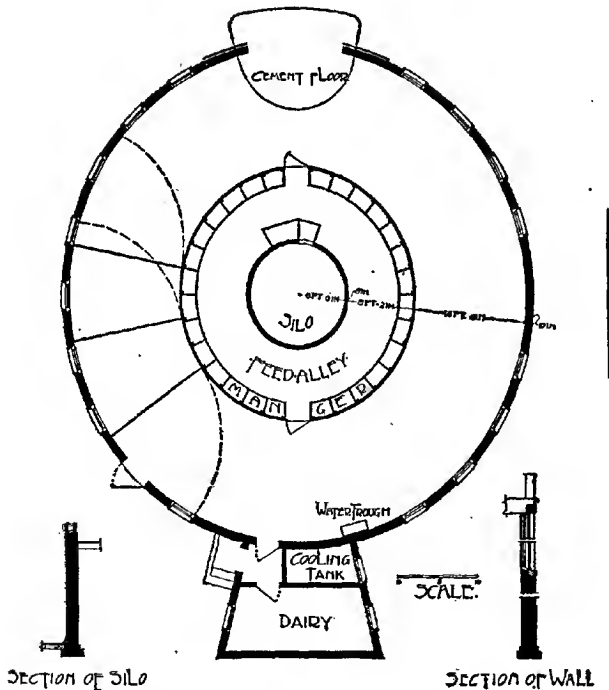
FIRST-FLOOR PLAN OF BARN NO. 1, UNIVERSITY OF ILLINOIS
